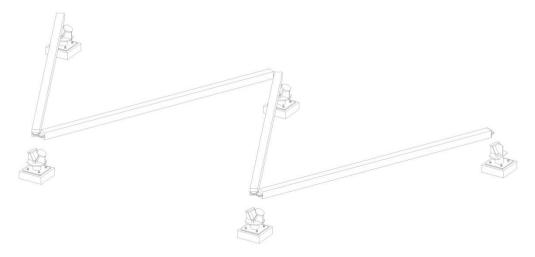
step three, the rectangular tube section beams are installed in this stage
